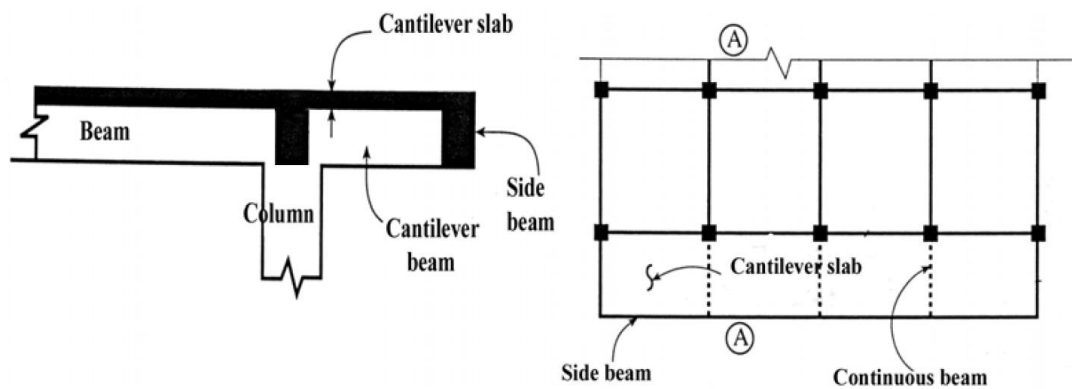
Cantilever Slabs (Özmen, 2008)
